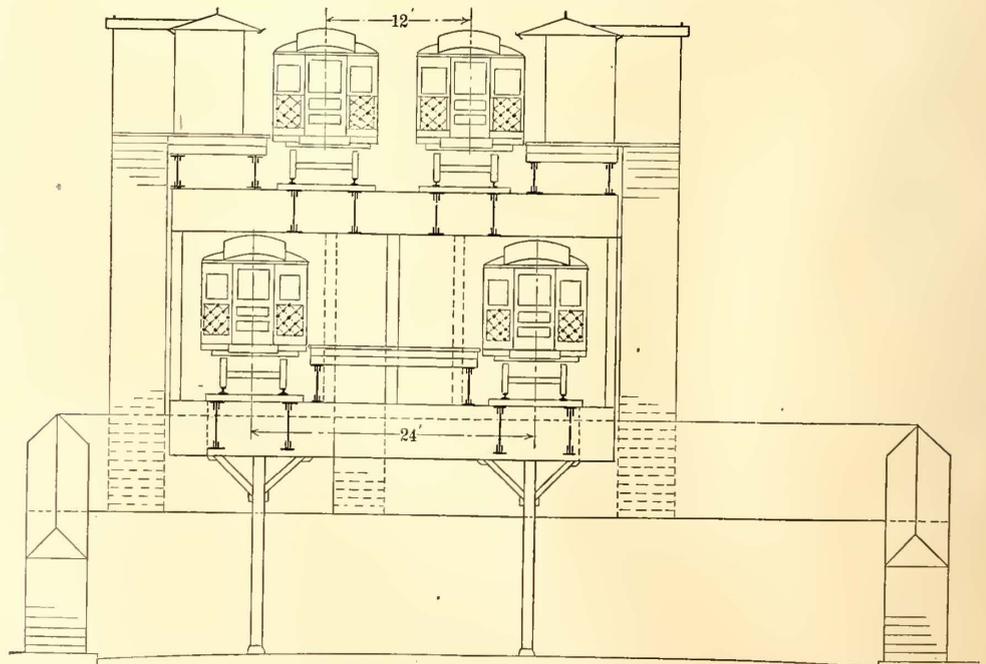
CROSS SECTION OF PROPOSED DOUBLE-DECK STRUCTURE AT 149TH STREET THIRD AVENUE, BRONX BOROUGH
